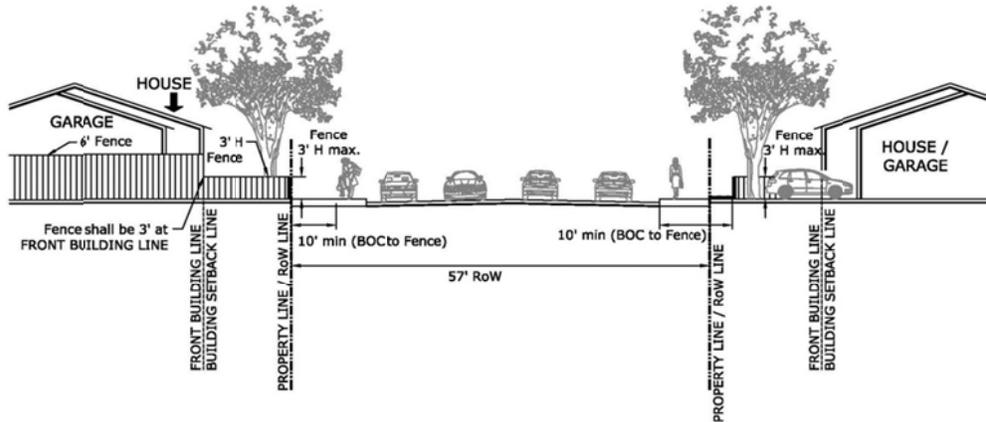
(d) - Typical Cross Section with NO Landscaped Area and Sidewalk
